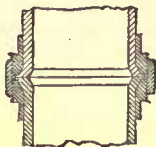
Screw-Joint with Flanges and Sleeves.
